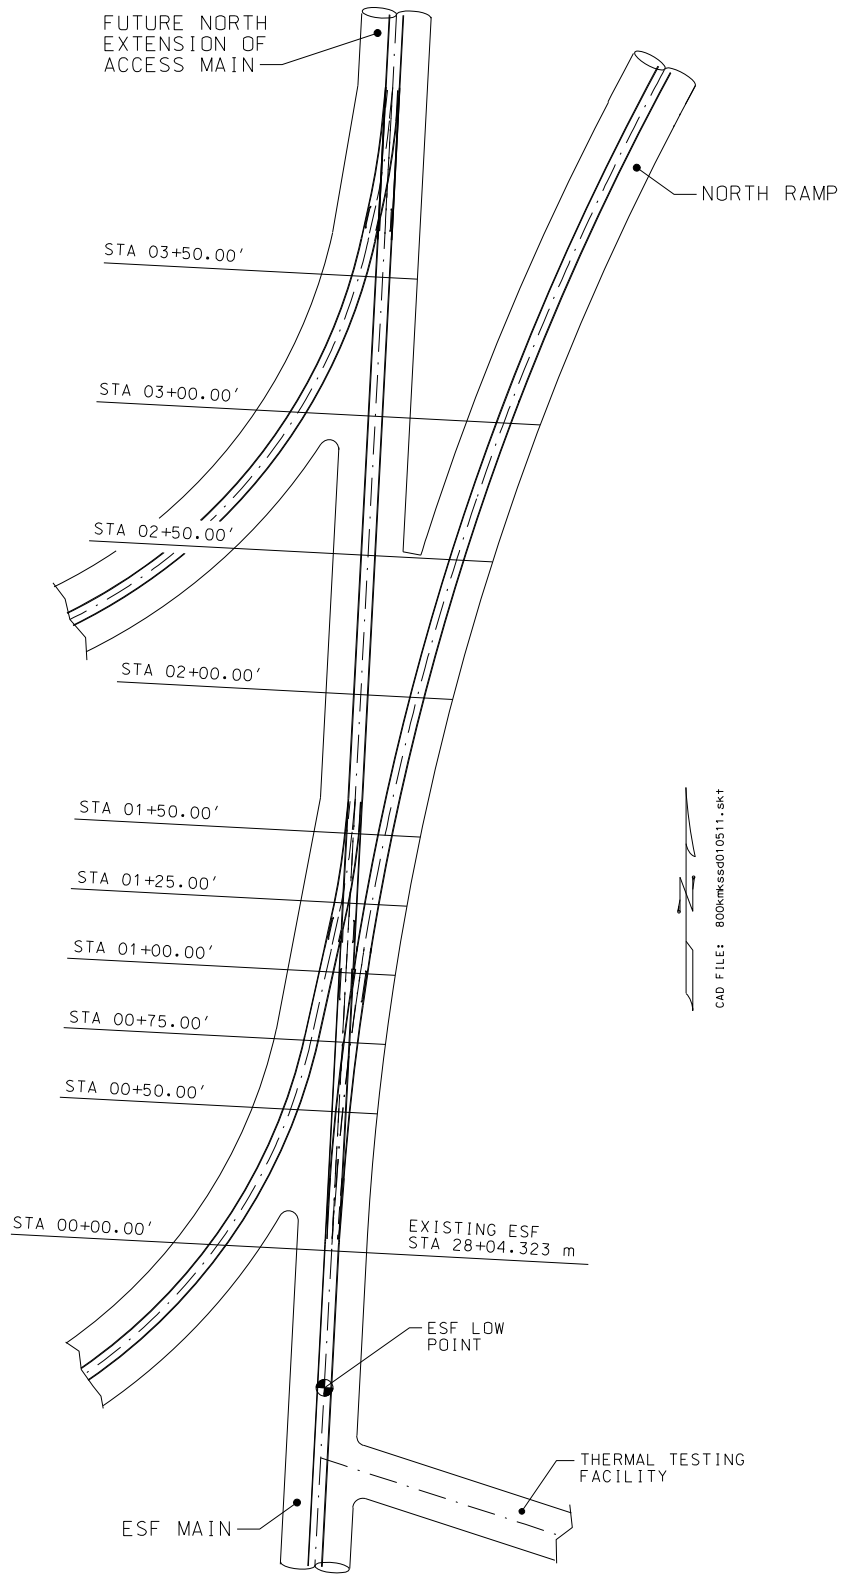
North Ramp and Future North Extension of the Access Main Intersection
